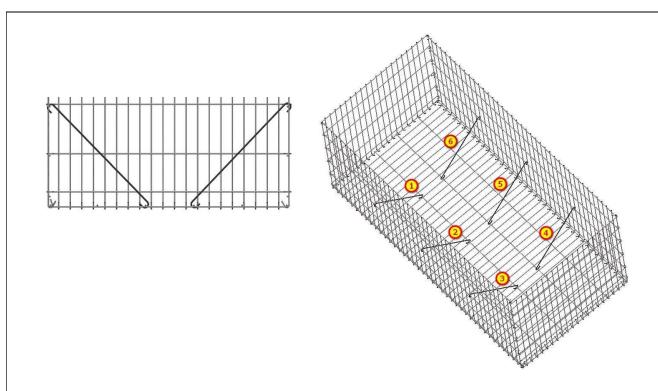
Step 9: insert 6 tie rods of cm 60 length between the plain side panel and the bottom panel (3 for each side panel)
